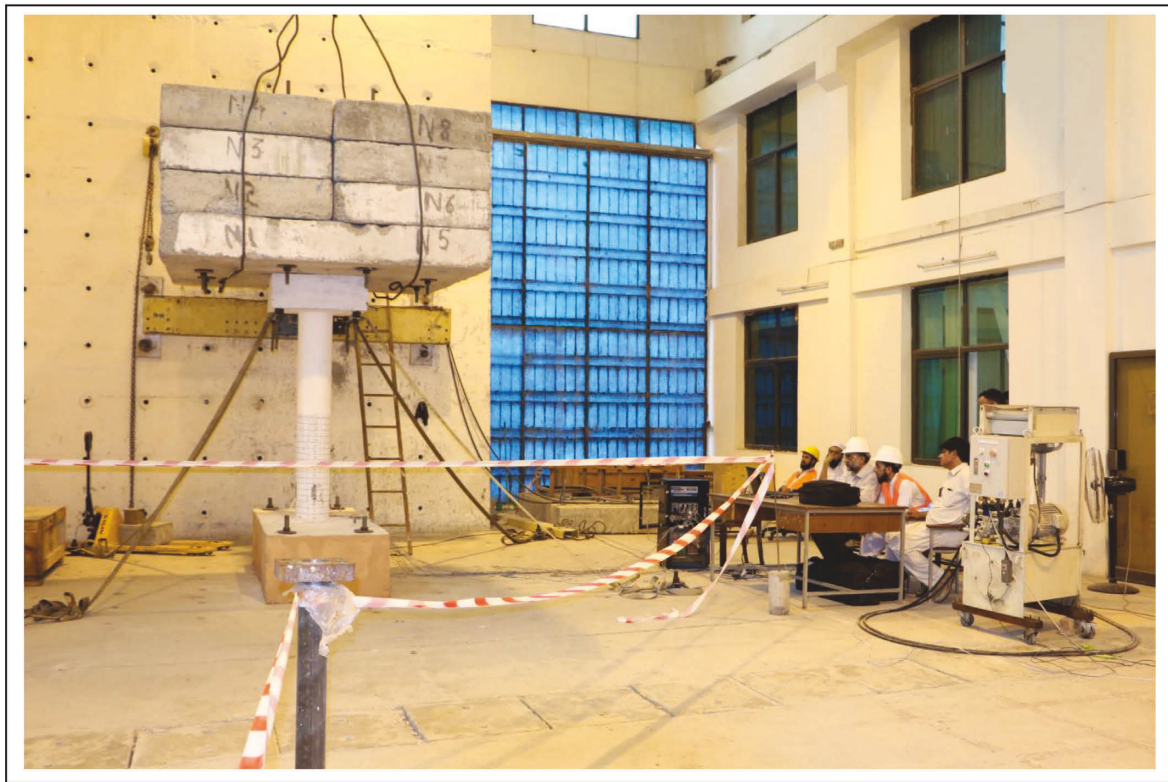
Test assembly setup with physical loading of 42.4 kips.
